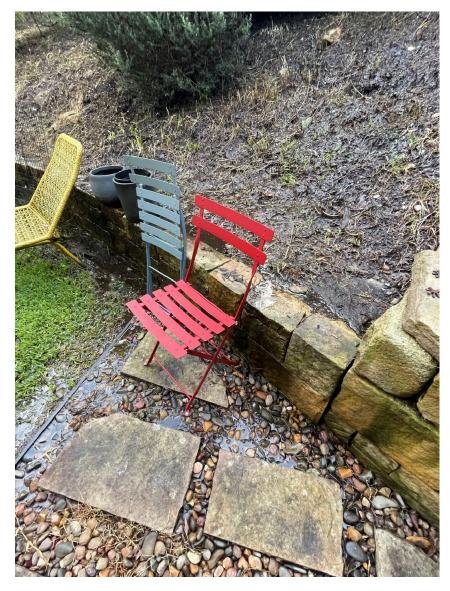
Showing onsite drainage issues and water inundation at base of existing wall.
